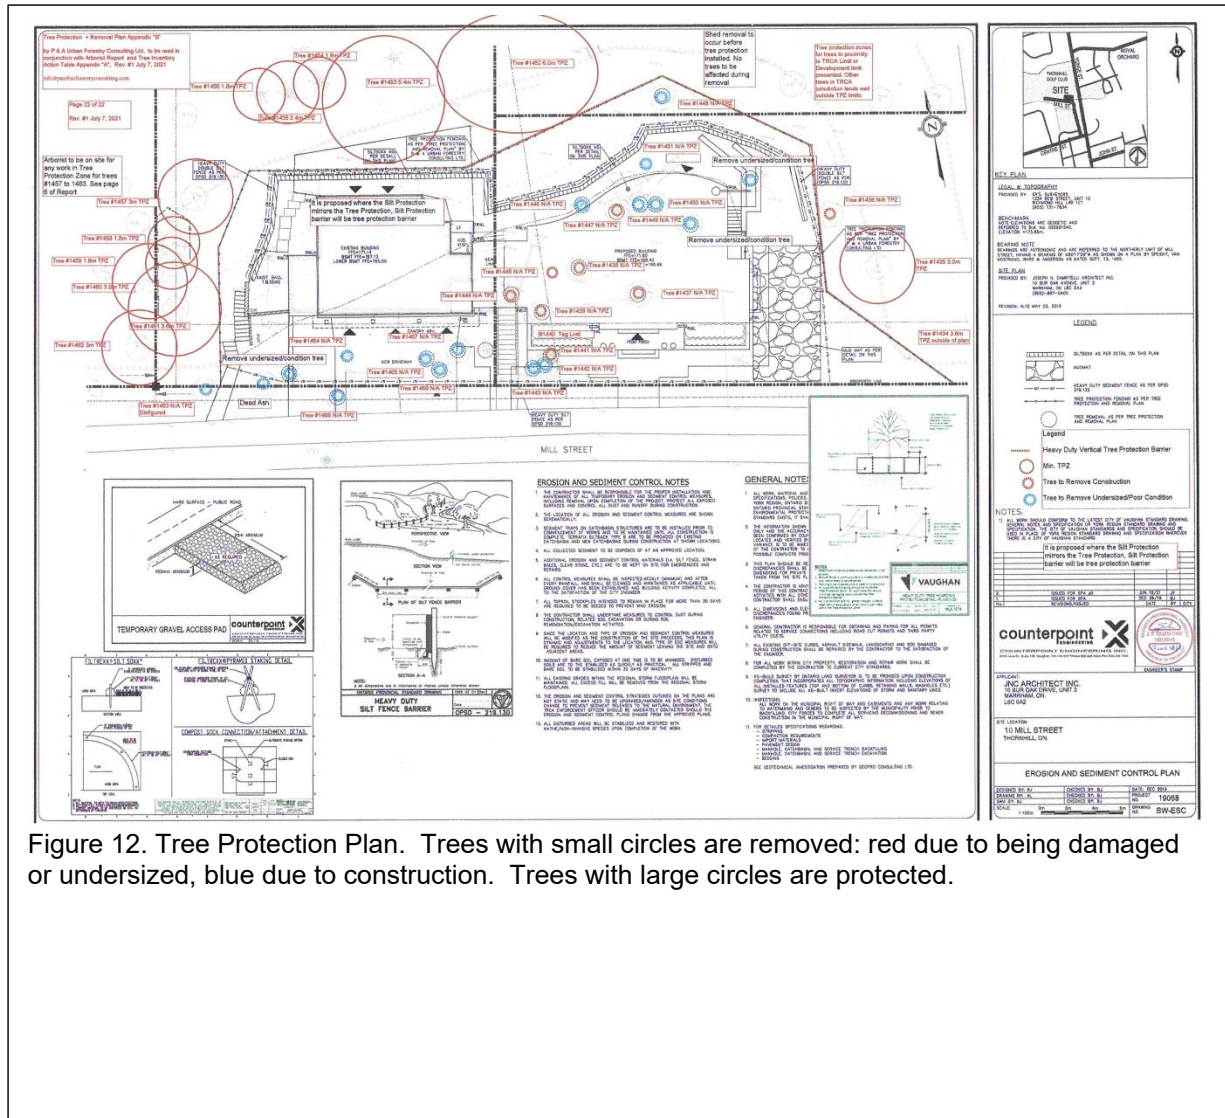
Tree Protection Plan. Trees with small circles are removed: red due to being damaged or undersized, blue due to construction. Trees with large circles are protected.
